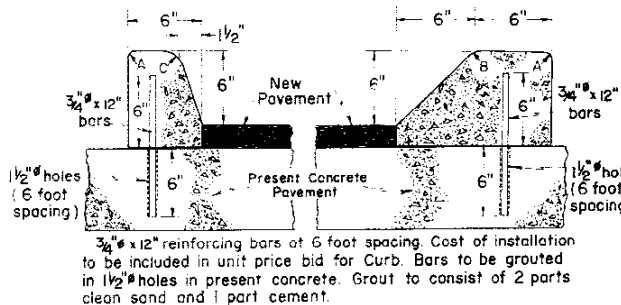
DETAILS OF CONCRETE COMBINATION CURB & GUTTER (VARIABLE) AND CONCRETE CURB (VARIABLE)
